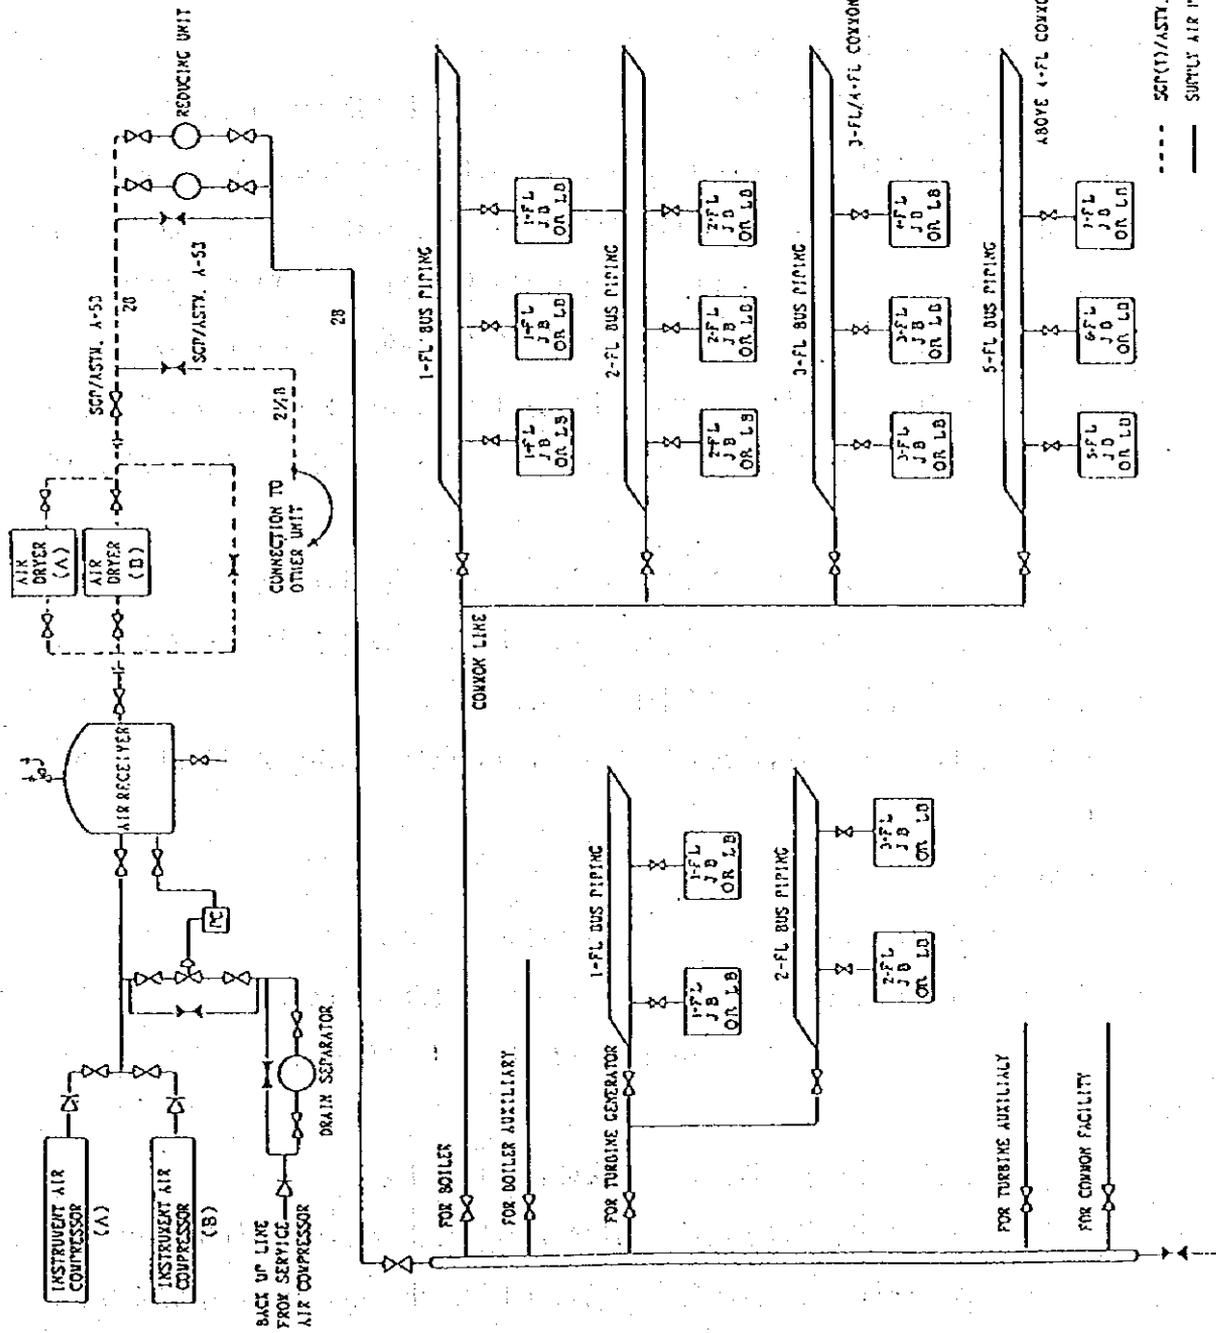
INSTRUMENT AIR PIPING LINE
